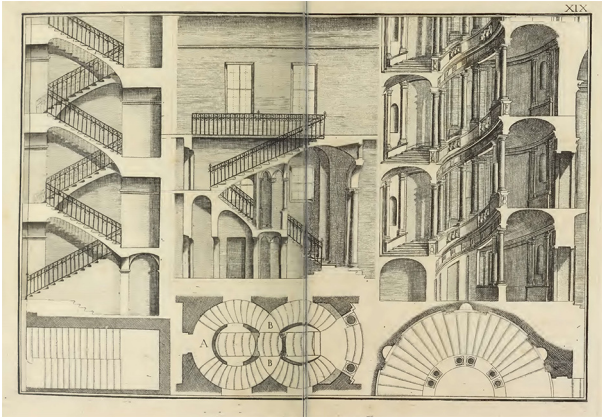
The drawings of the staircases by Bernardo Antonio Vittone in floor-plan and cross-section.
